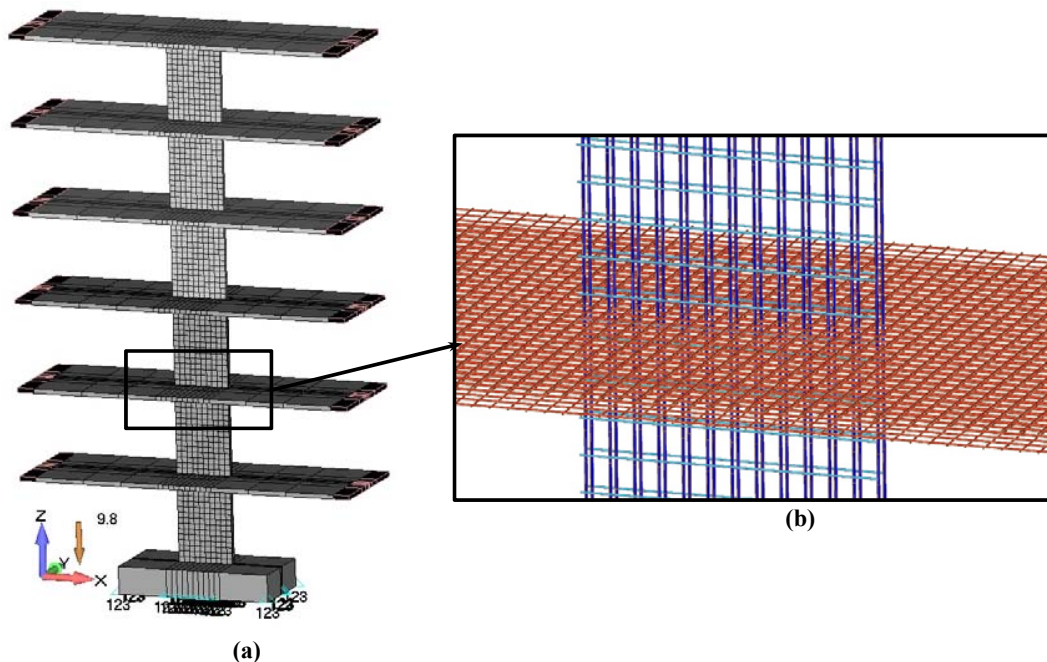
Finite Element Mesh of the fixed base model (a) Concrete hexahedral elements, (b) Embedded rebar elements
